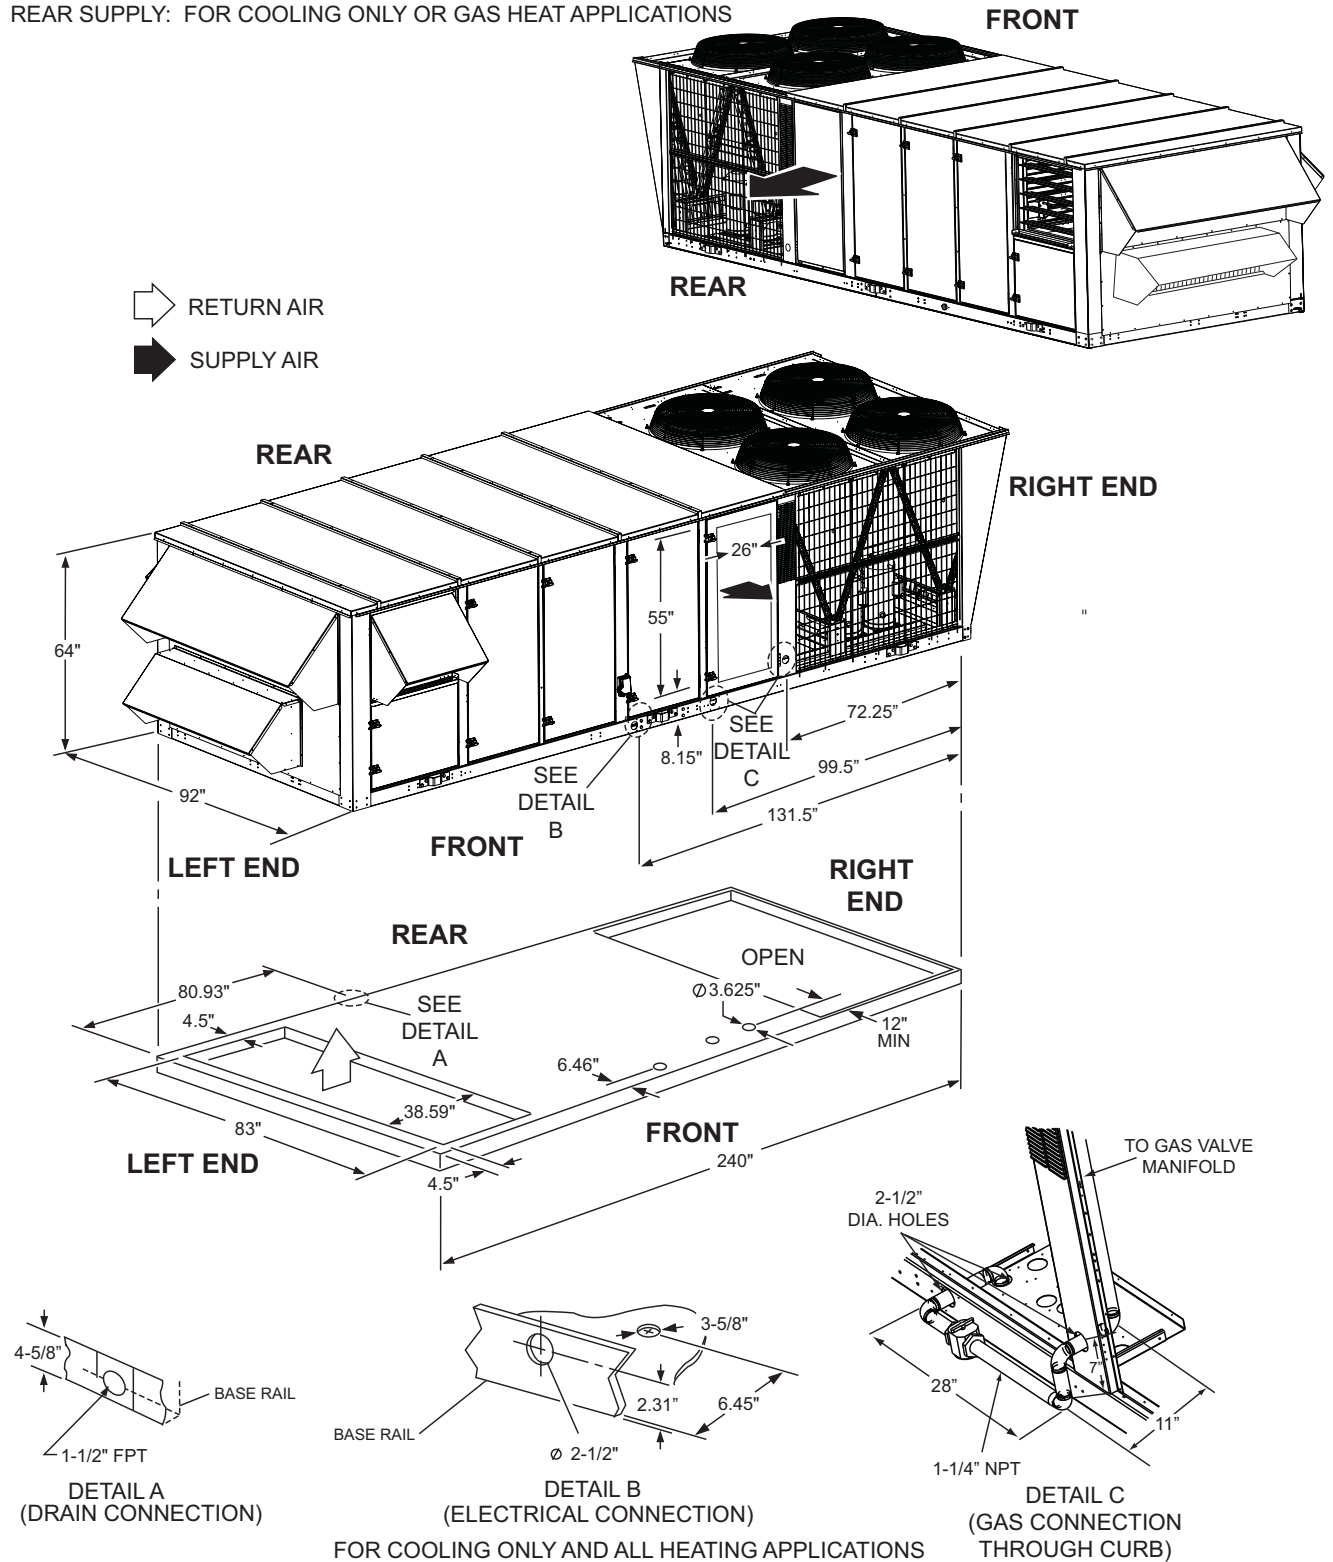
BOTTOM RETURN, FRONT & REAR SUPPLY
